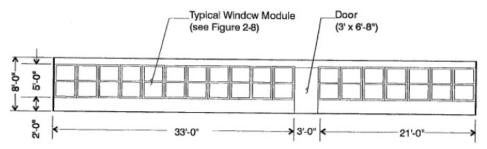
Case L150A South Wall Elevation Showing Windows (ANSI/ASHRAE 2011, Figure 7-12)
